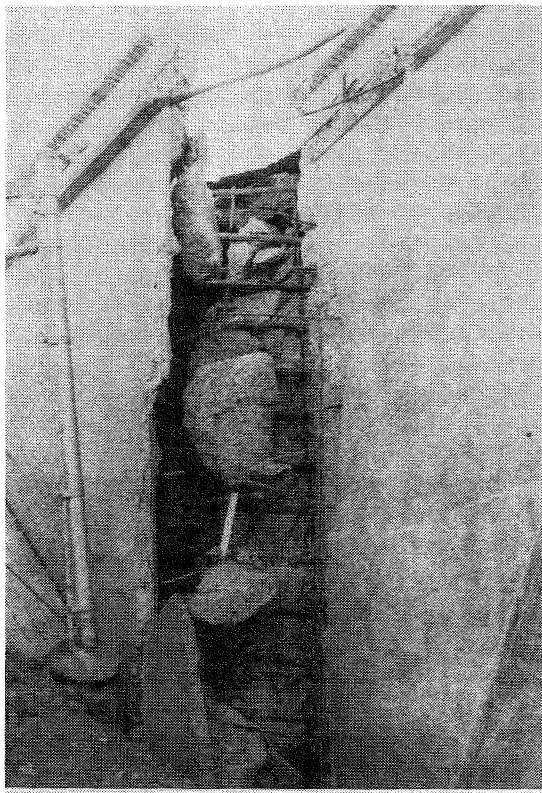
Fracture of the wing-wall at the eastern abutment of the southern bridge, Roxford Street Undercrossing. A severe lateral failure of the piles at this abutment resulted in a 2 ft 6 in horizontal displacement.
